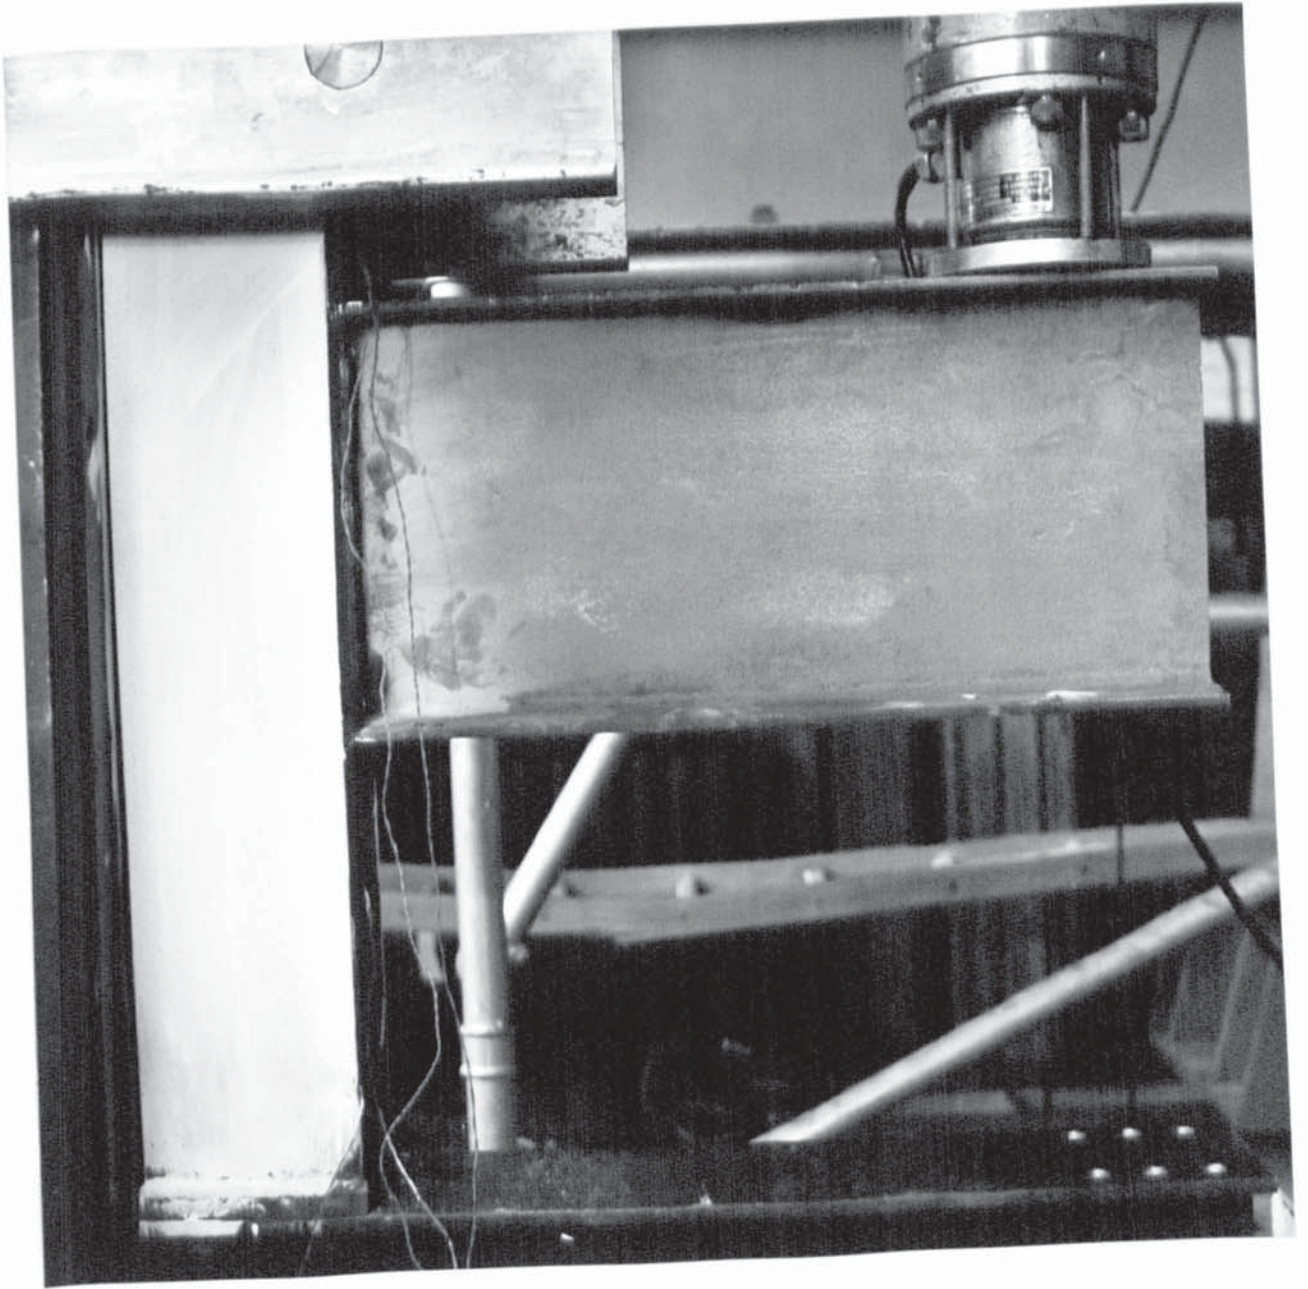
Secondary beam-to-column connection fixed in the rig ready for testing.
